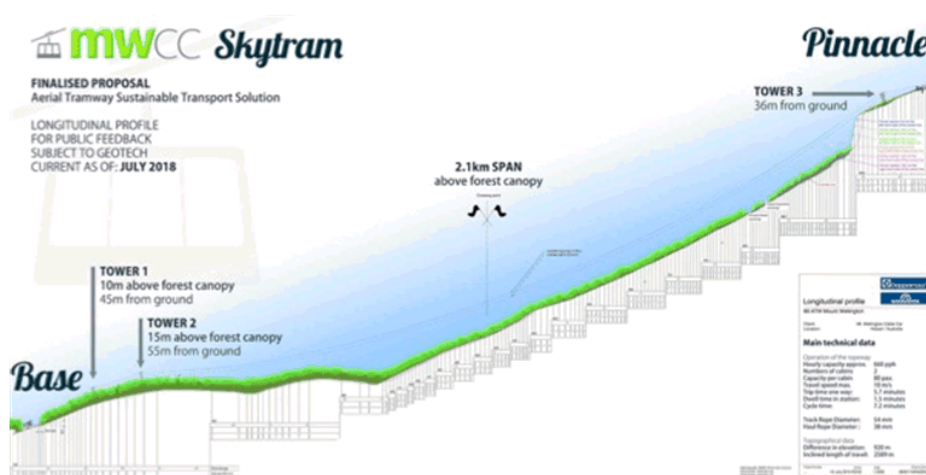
Longitudinal section of cable way (Source: Garaventa Ltd. & Mount Wellington Cableway Company).
